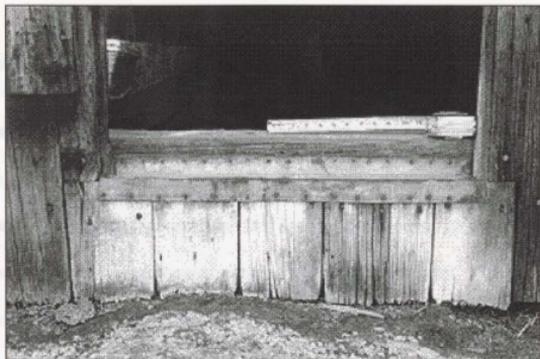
Chicken Coop, West Elevation, Detail Showing Metal Discoloration.
